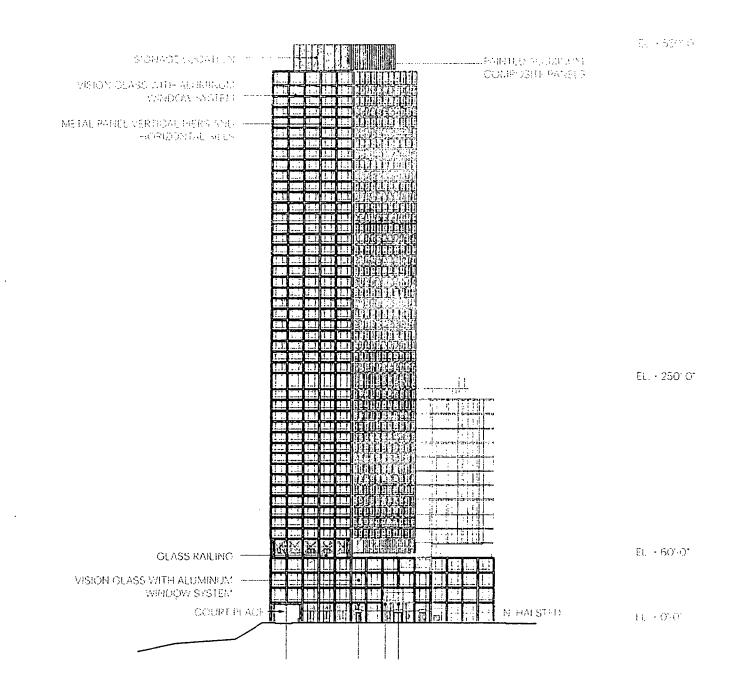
A: NORTH TOWER ELEVATION WITH RANDOLPH STREETSCAPE
